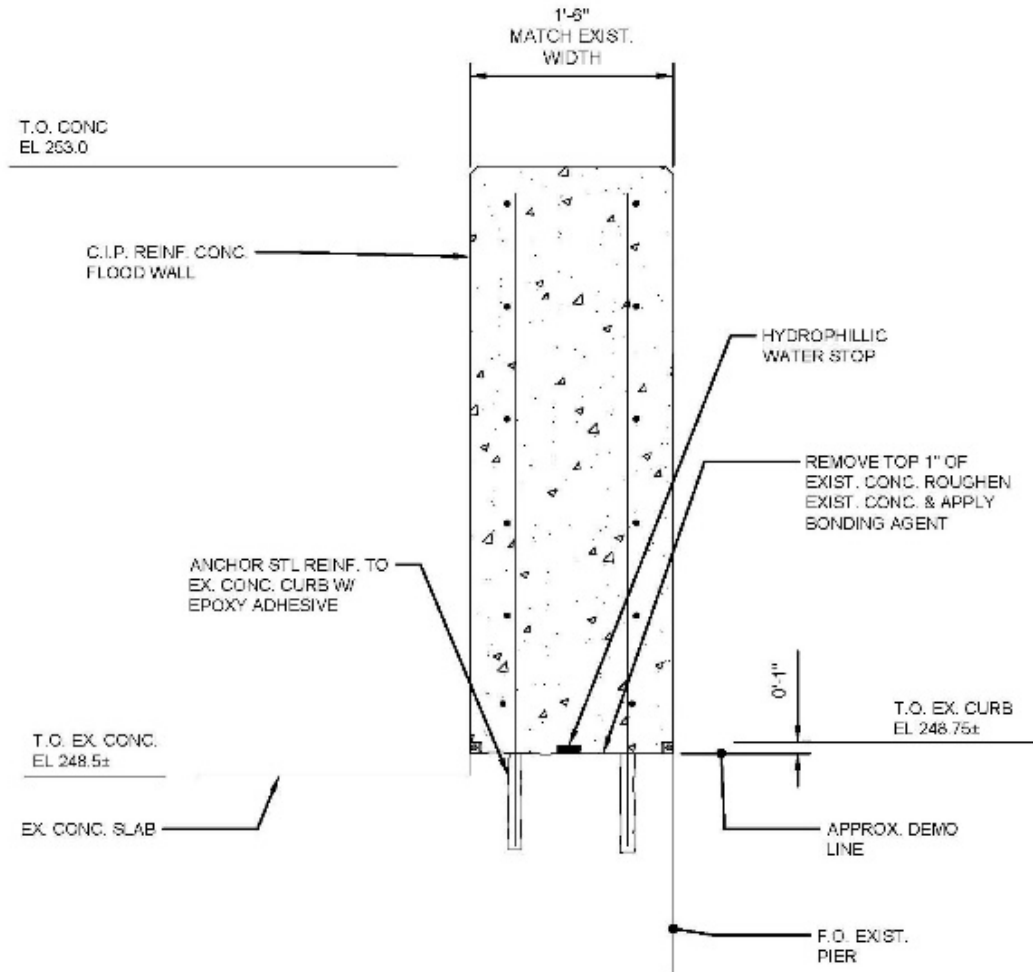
NYSDEC Fishing Access Existing Curb Modifications Typical Detail
